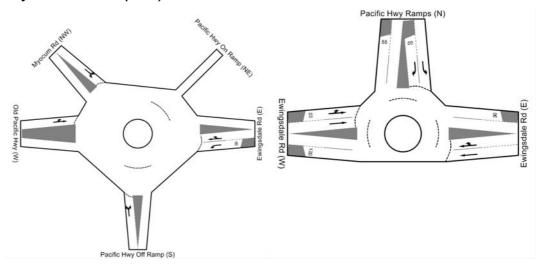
Upgraded highway + new western roundabout + additional NB on-ramp
